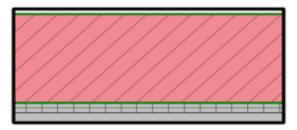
Cross section of 9" wall (1" insulation and 0.5" plaster)
